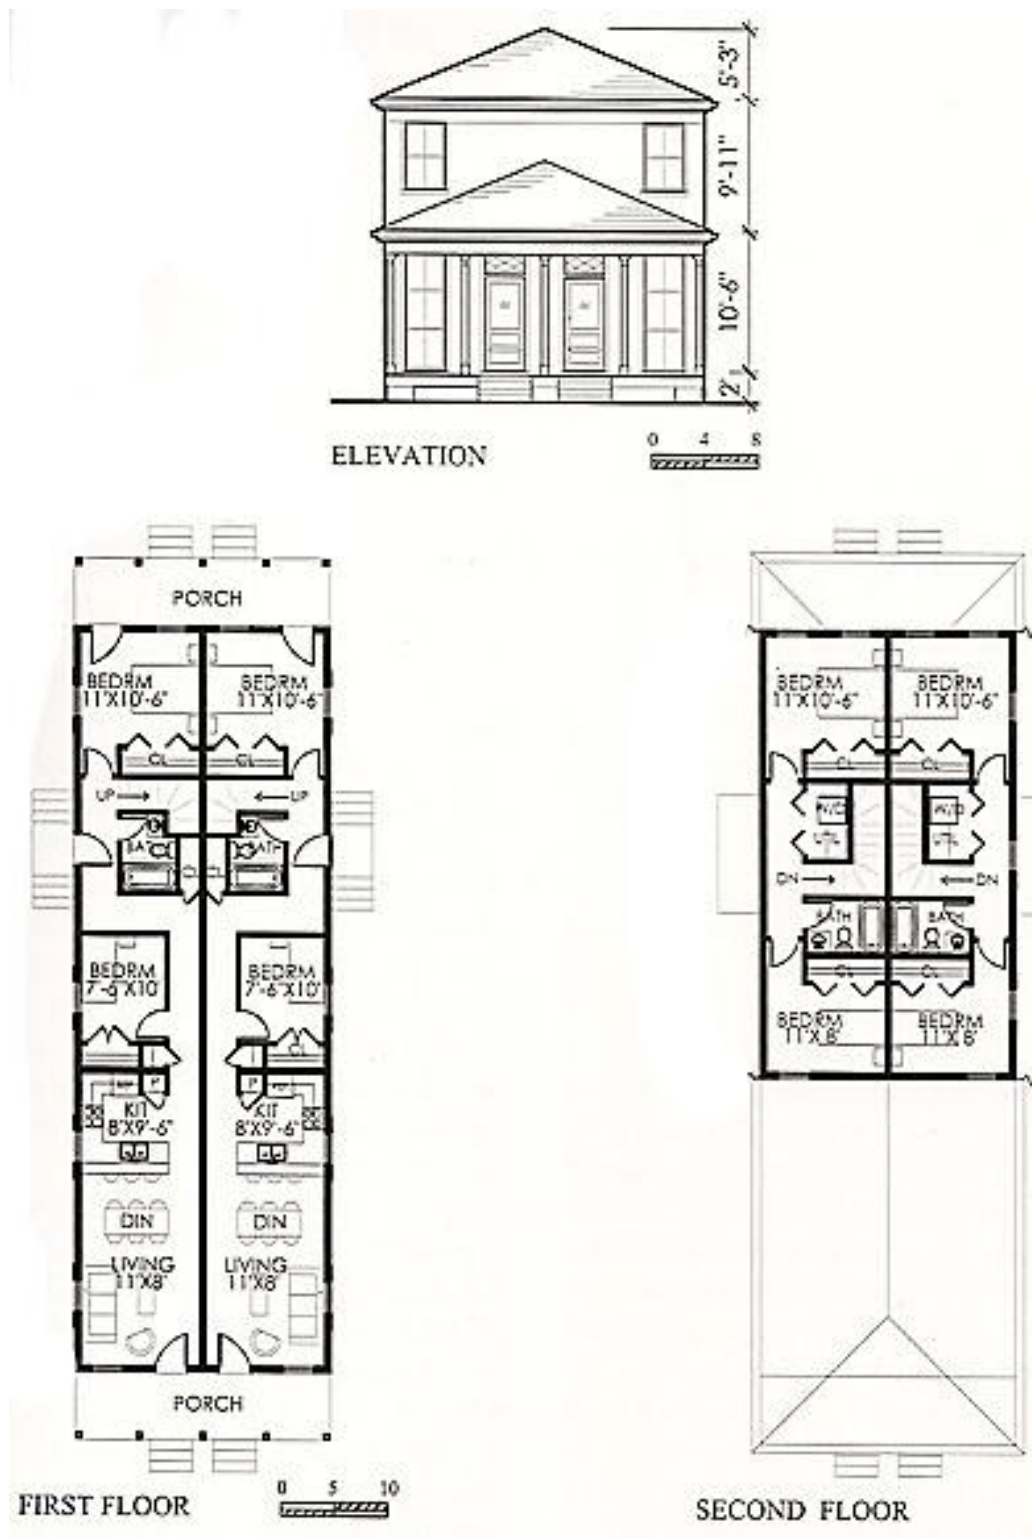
Example of a standard, traditional four-bay, double barrel, camelback shotgun house in plan and elevation from Roulhac Toledano's *A Pattern Book of New Orleans Architecture*.
